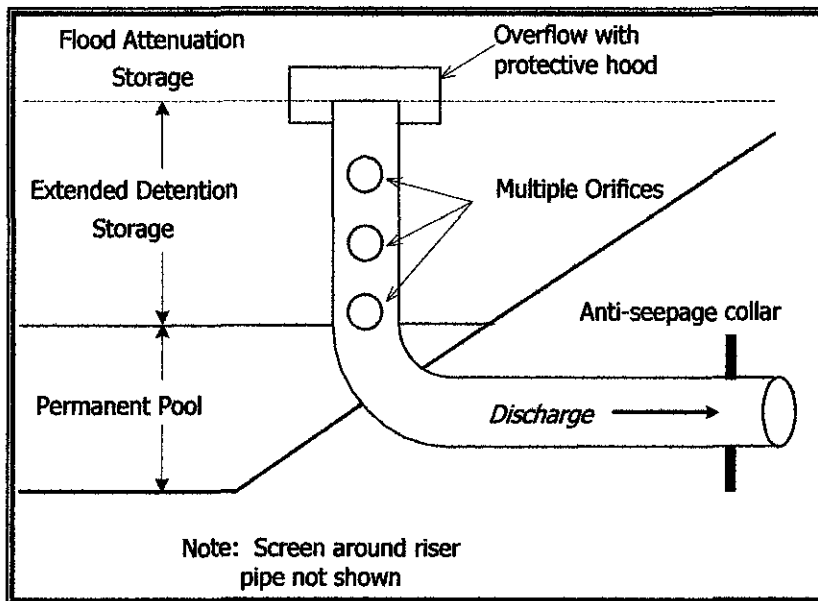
Schematic view of a typical riser pipe outlet design for a constructed wetland
